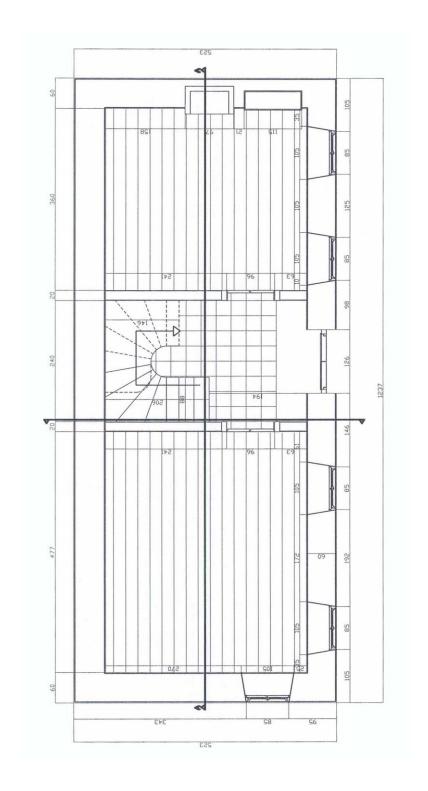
Ground Floor Plan of 19-Hamam Street Scale: 1/75
